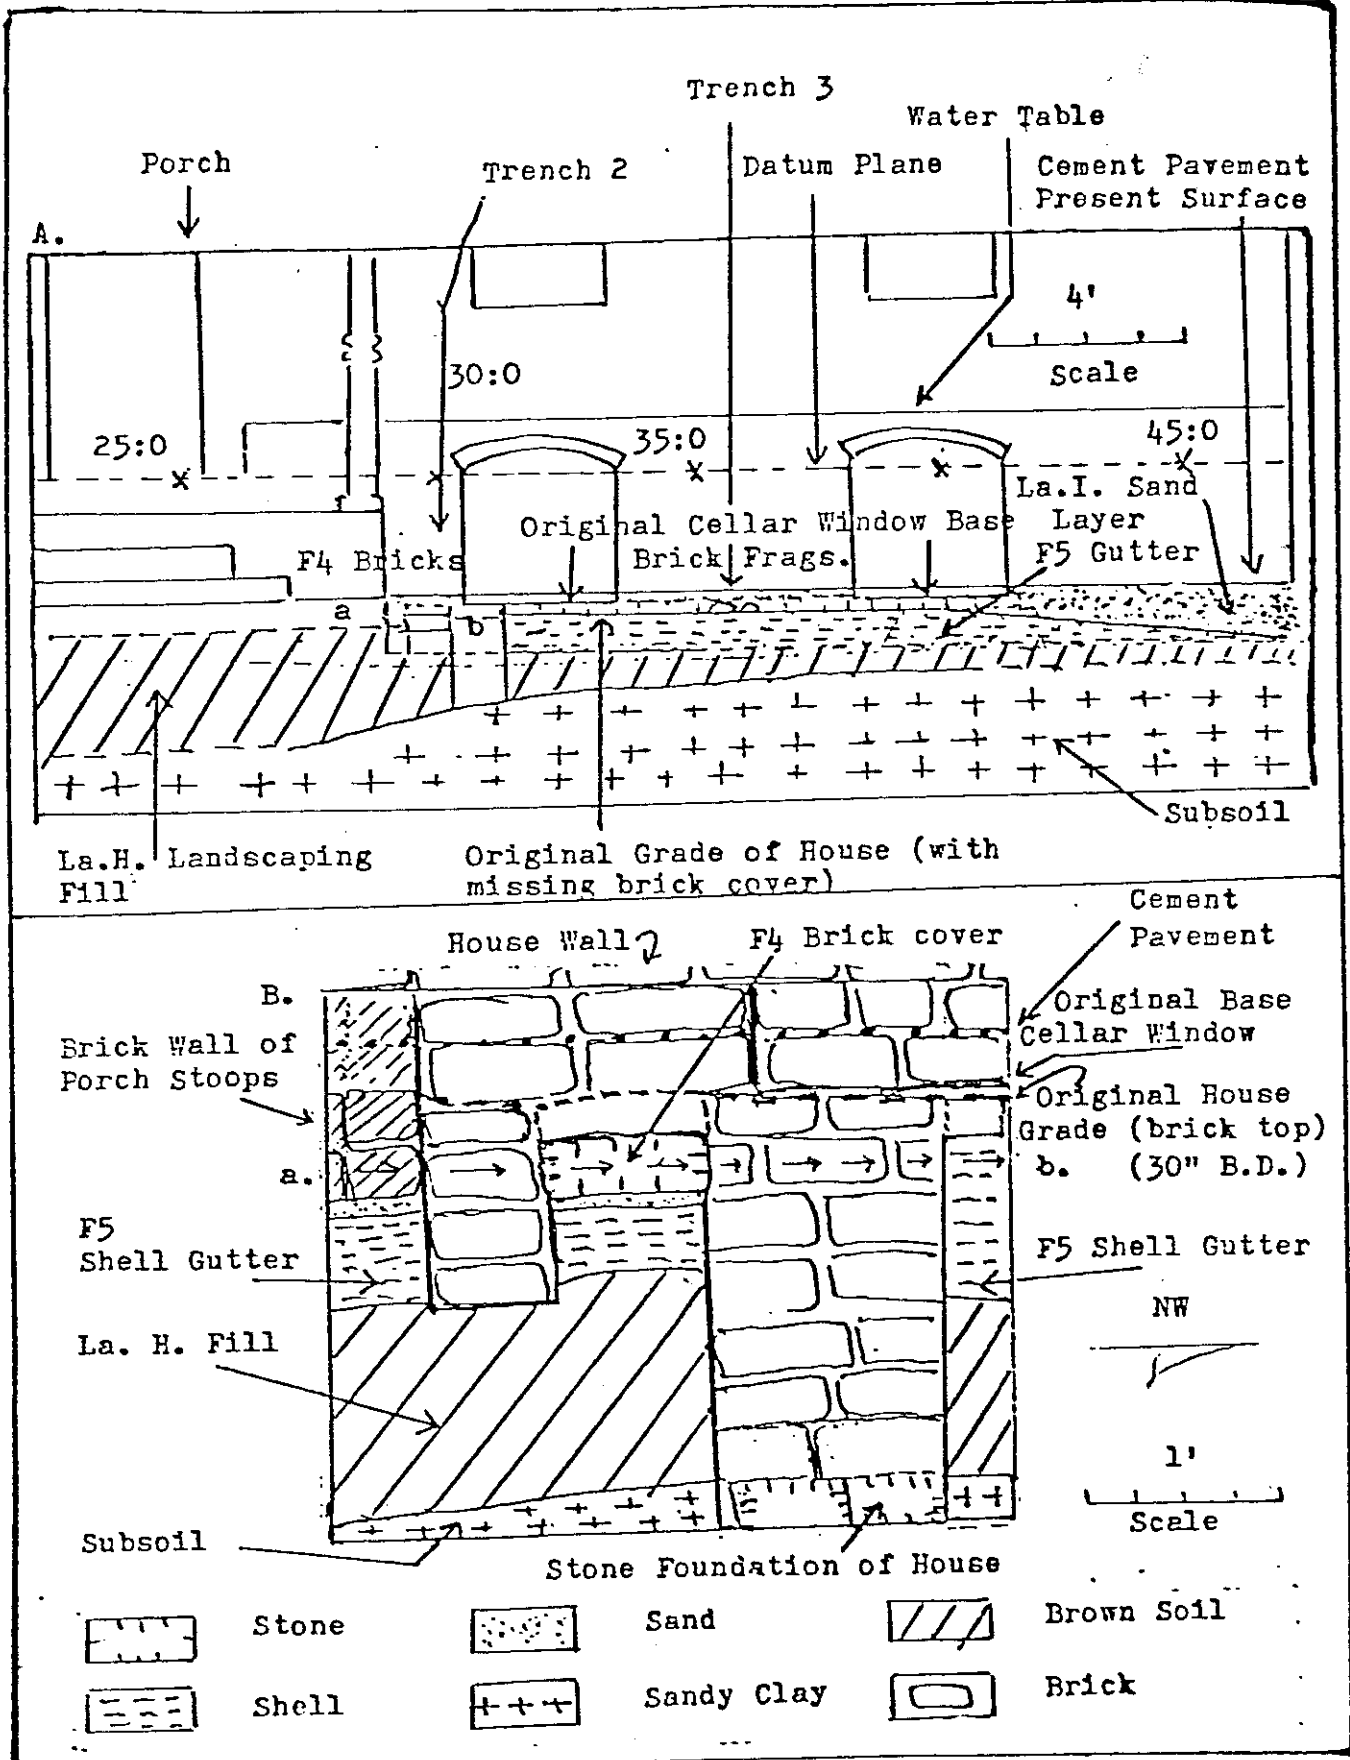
Oyster Shell Gutter, Reynolds Tavern Front. A. Northeast Elevation Section. B. Profile a-b through Trench 2.
